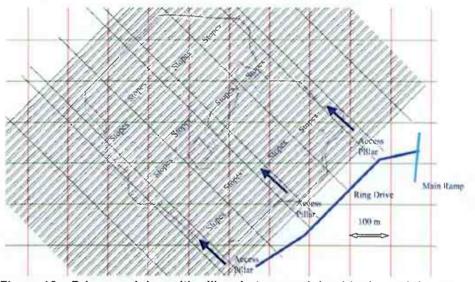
Primary mining with pillars between mining blocks and the stopes
